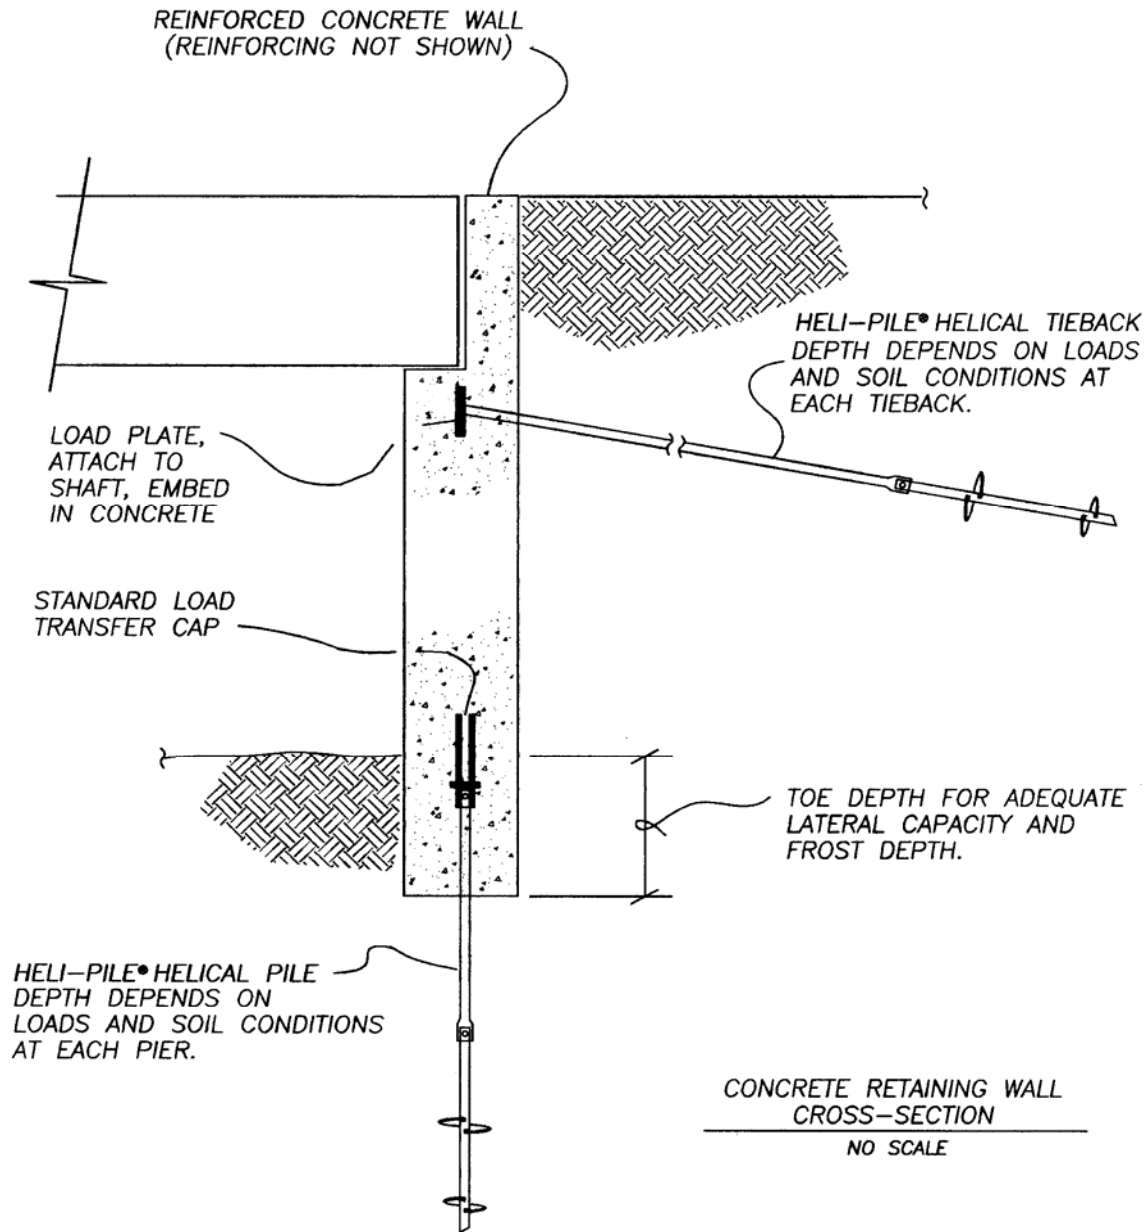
Vertical Helical Piles and Helical Tension Anchors as Tiebacks for Bridge Abutment (See Photos 1-33 and 1-34)
